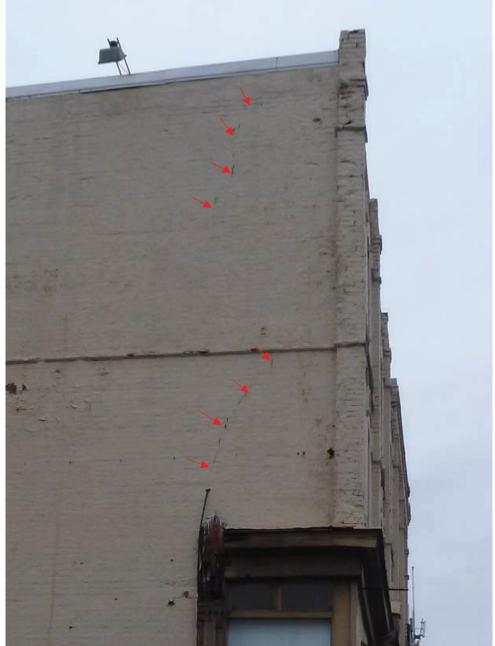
General view of south elevation of southeast corner of Building 'A'. Significant step crack in brick wall noted at top of second floor to roof.
